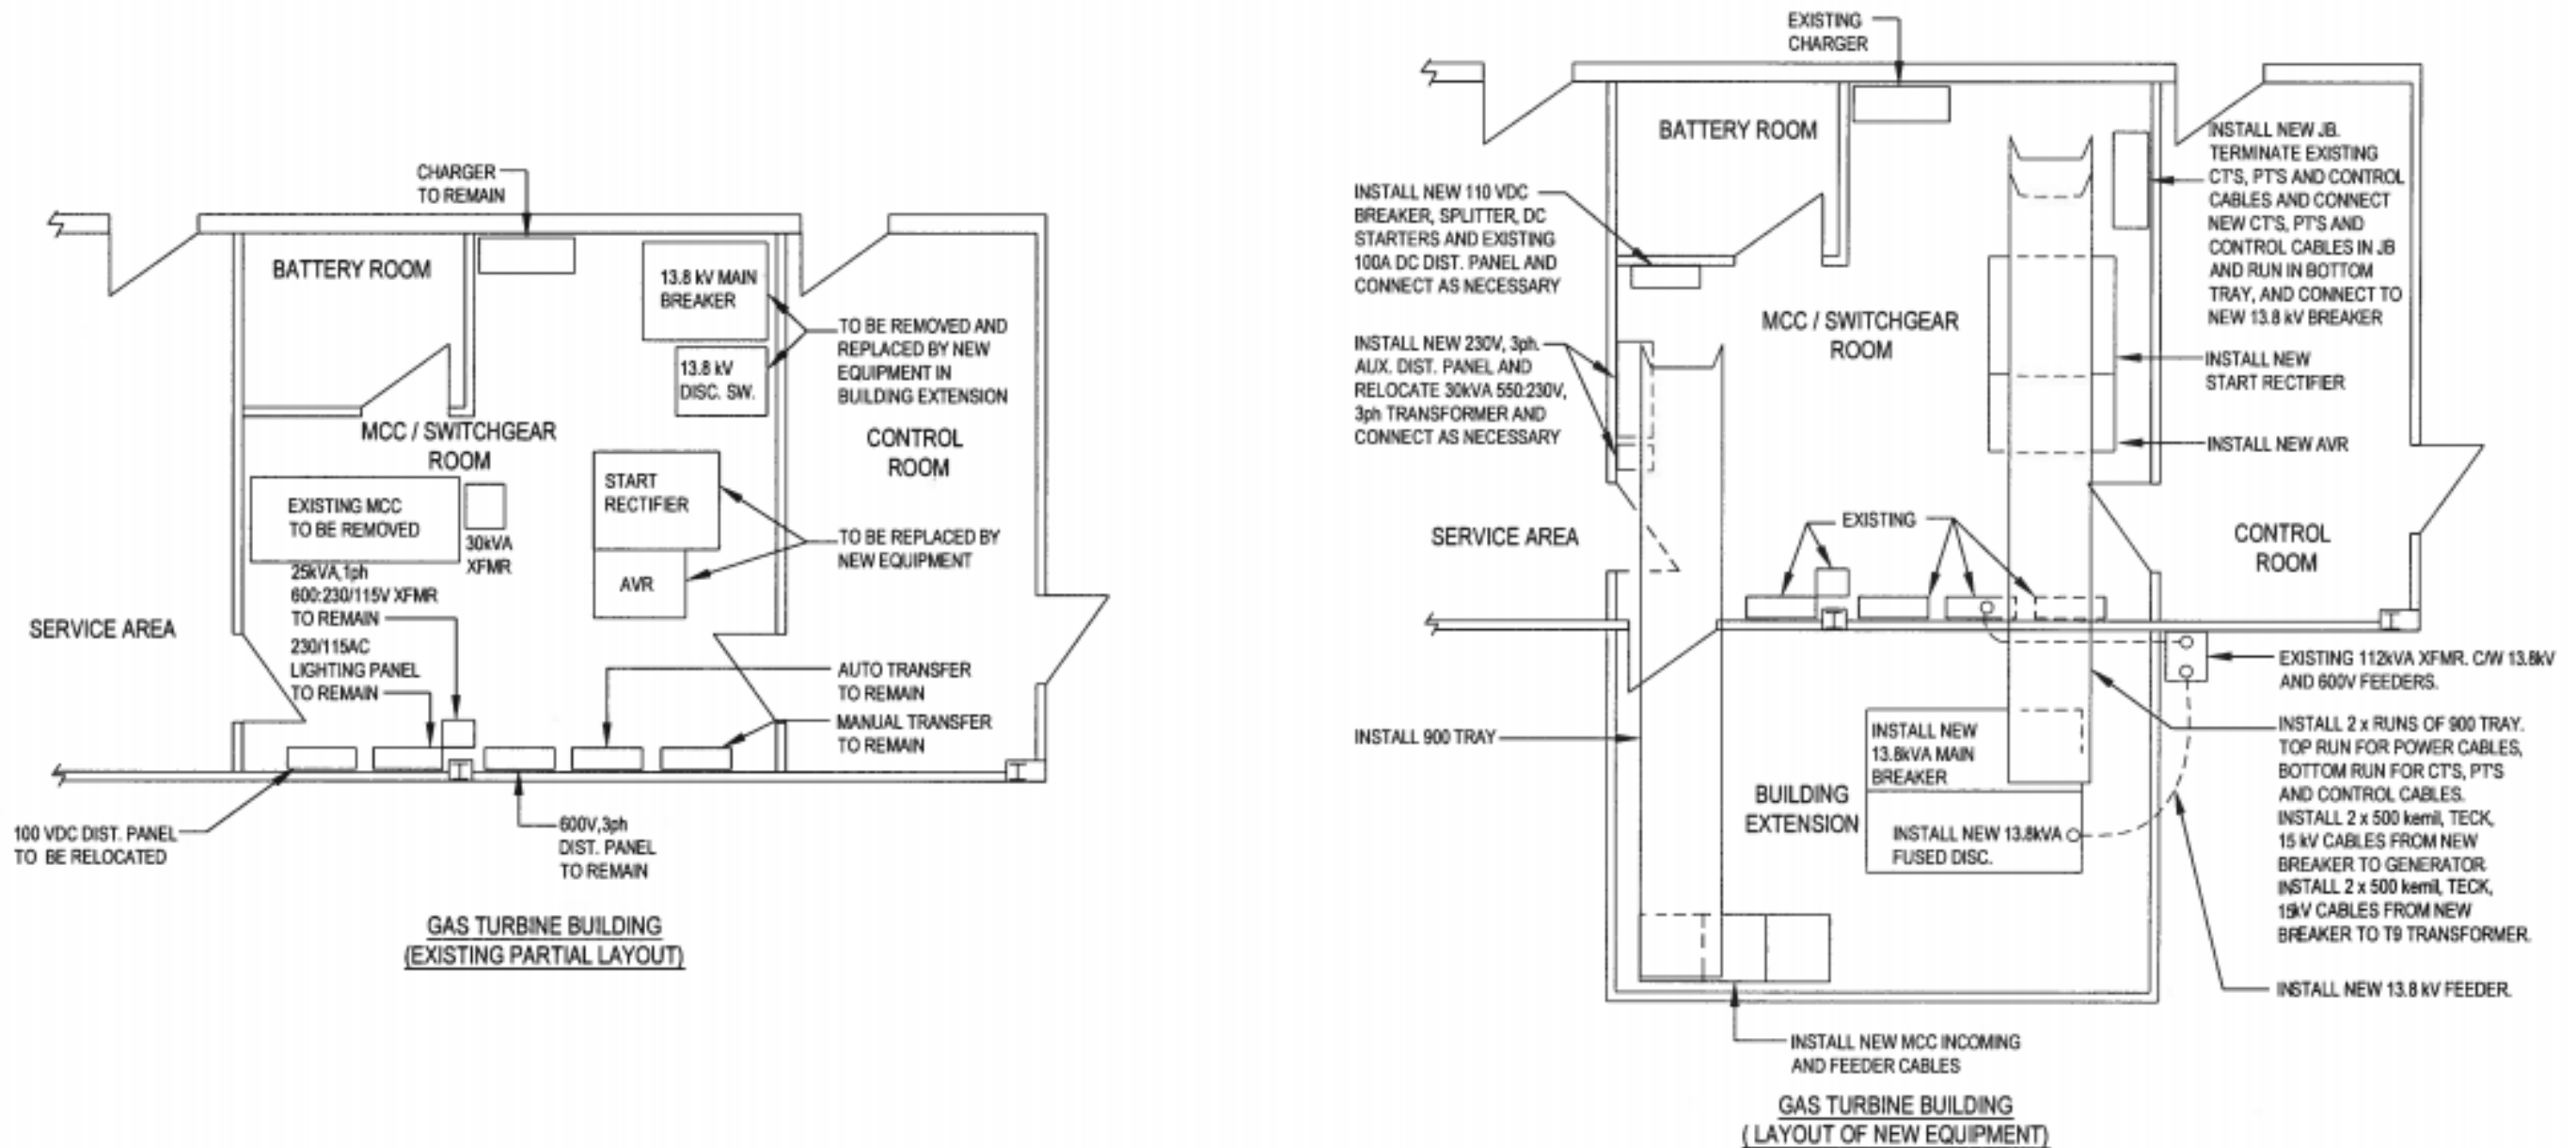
GAS TURBINE BUILDING – ELECTRICAL & CONTROLS – CURRENT AND PROPOSED
